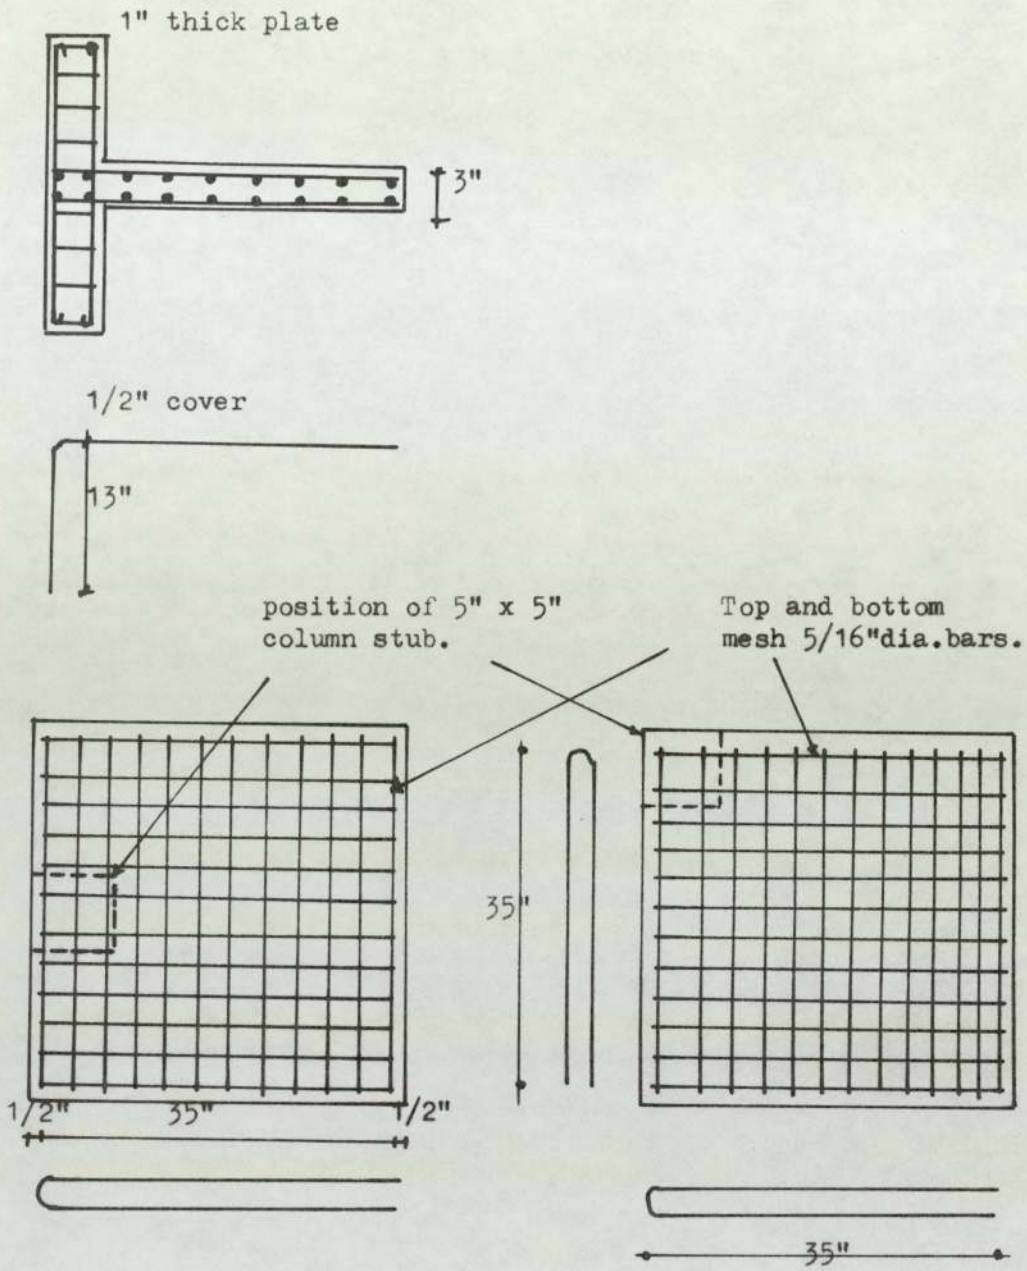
Dimensions and reinforcement for edge and corner connections tested at Imperial College by Stamankovic.
